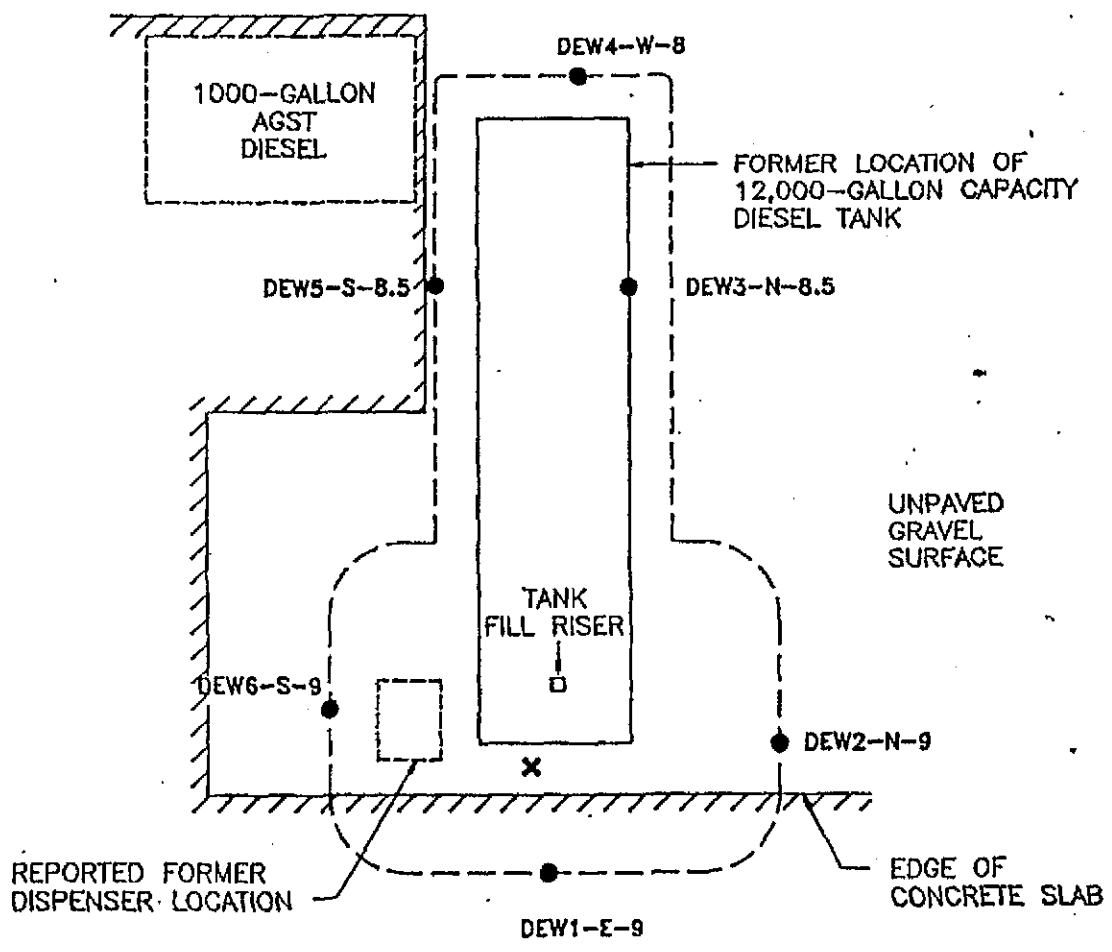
PLAN SHOWING FORMER TANK AND SOIL SAMPLE LOCATIONS
